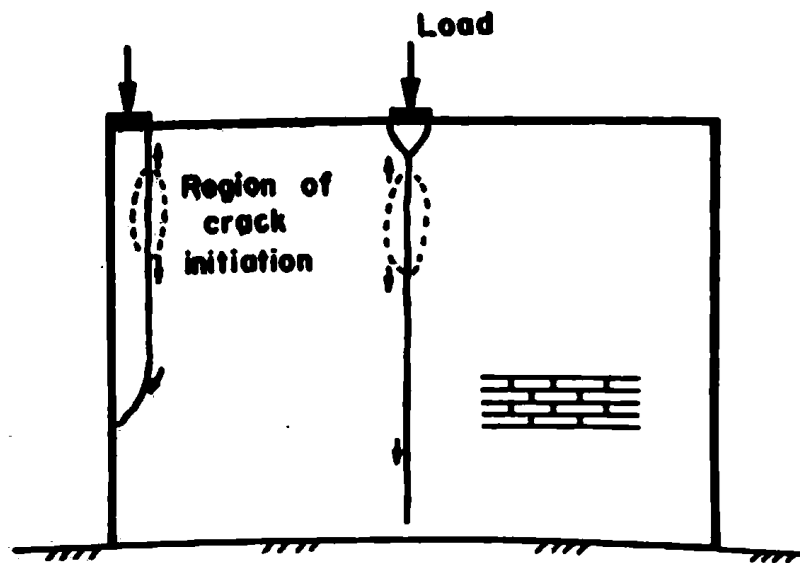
Failure mechanisms of masonry wall subject to concentrated loads (Page & Hendry, 1988)
